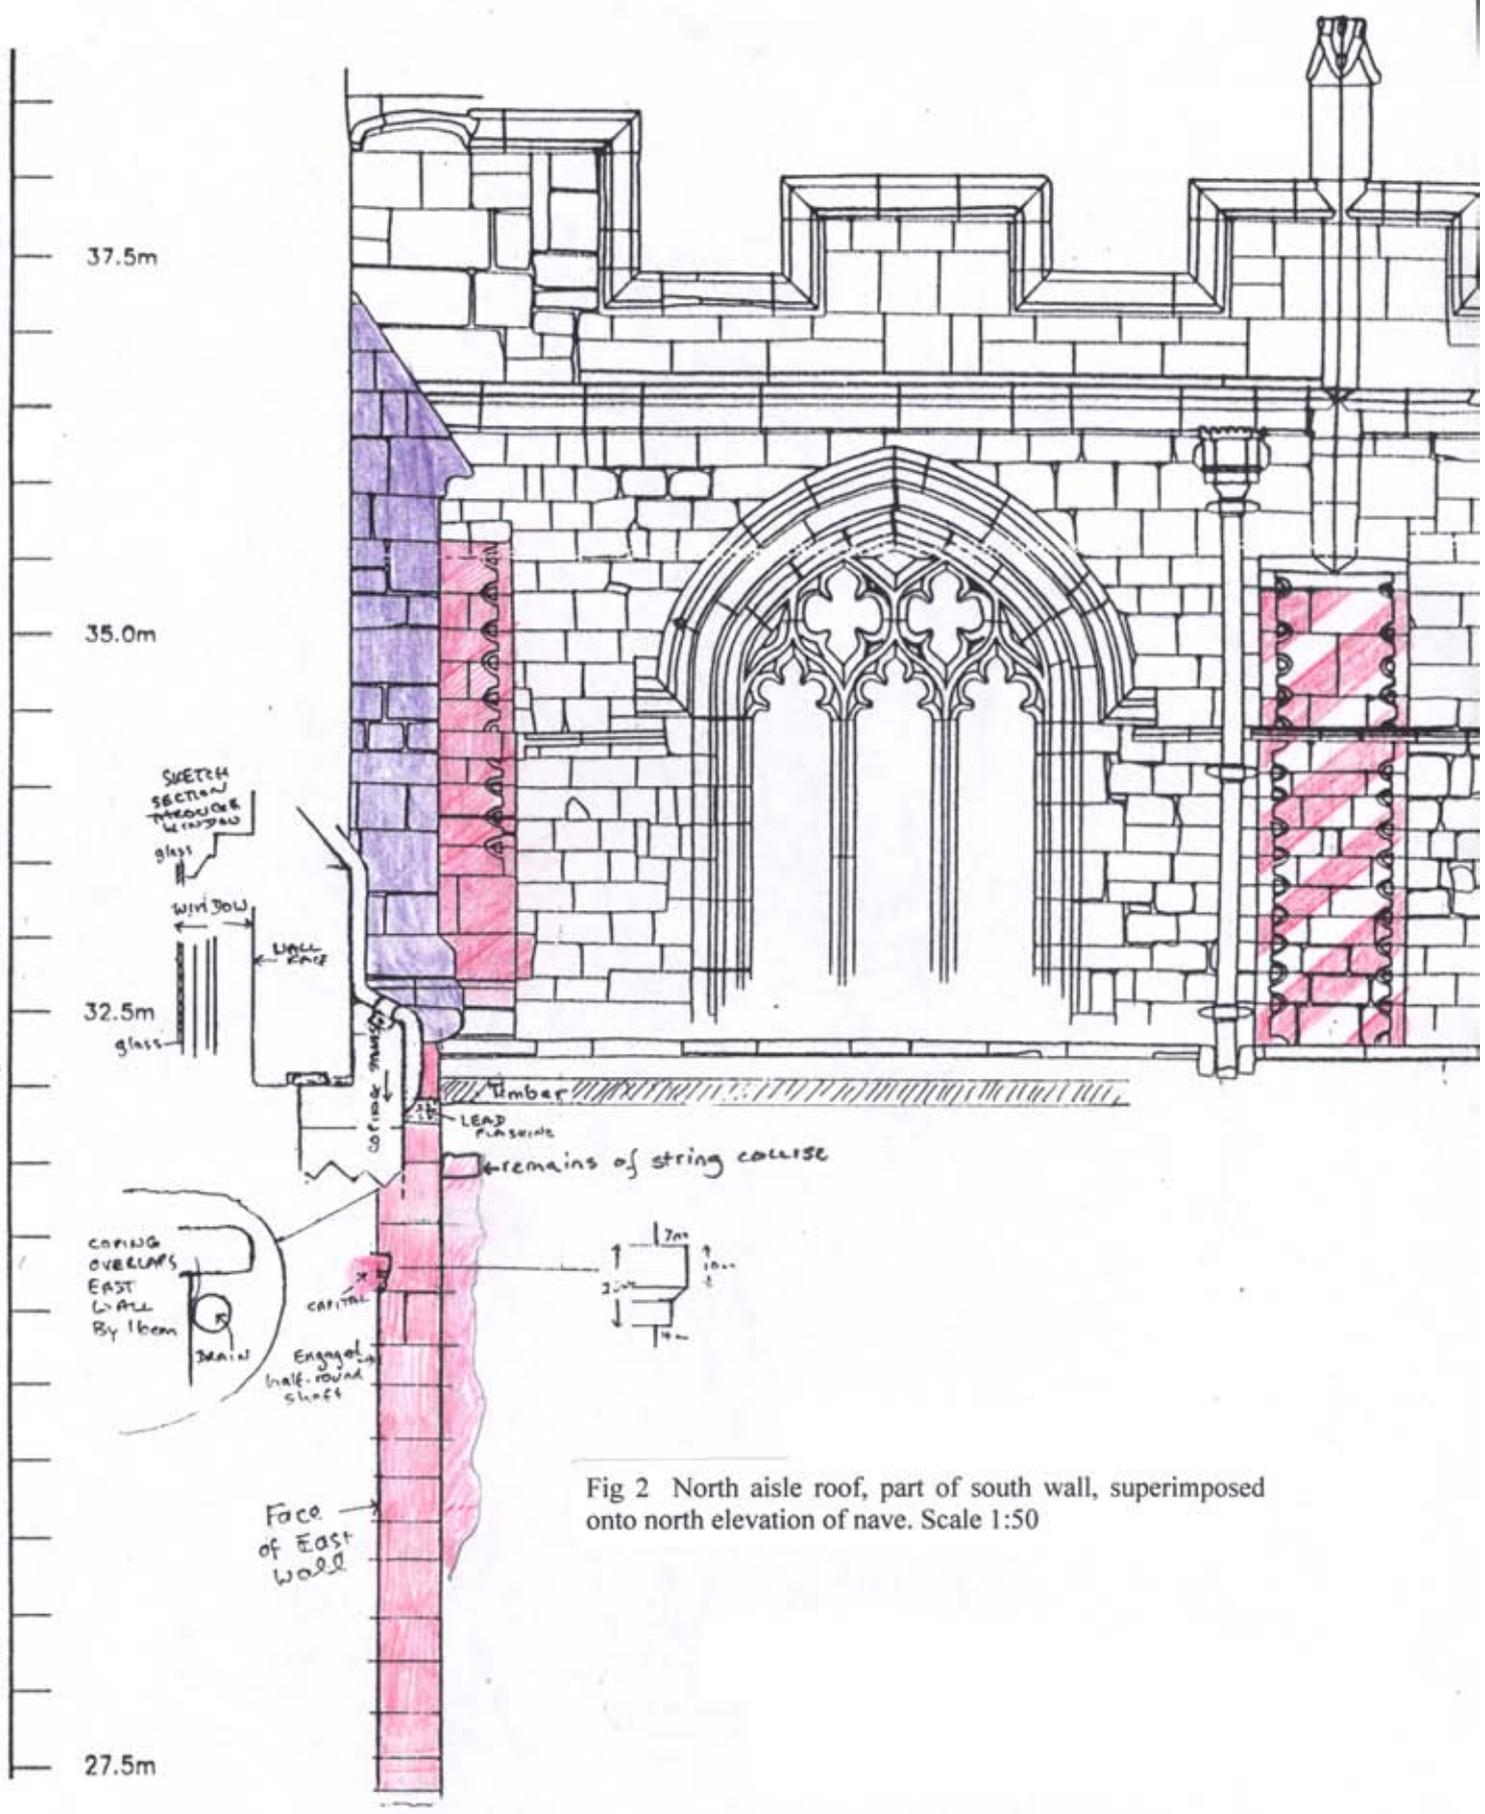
North aisle roof, part of south wall, superimposed onto north elevation of nave. Scale 1:50
